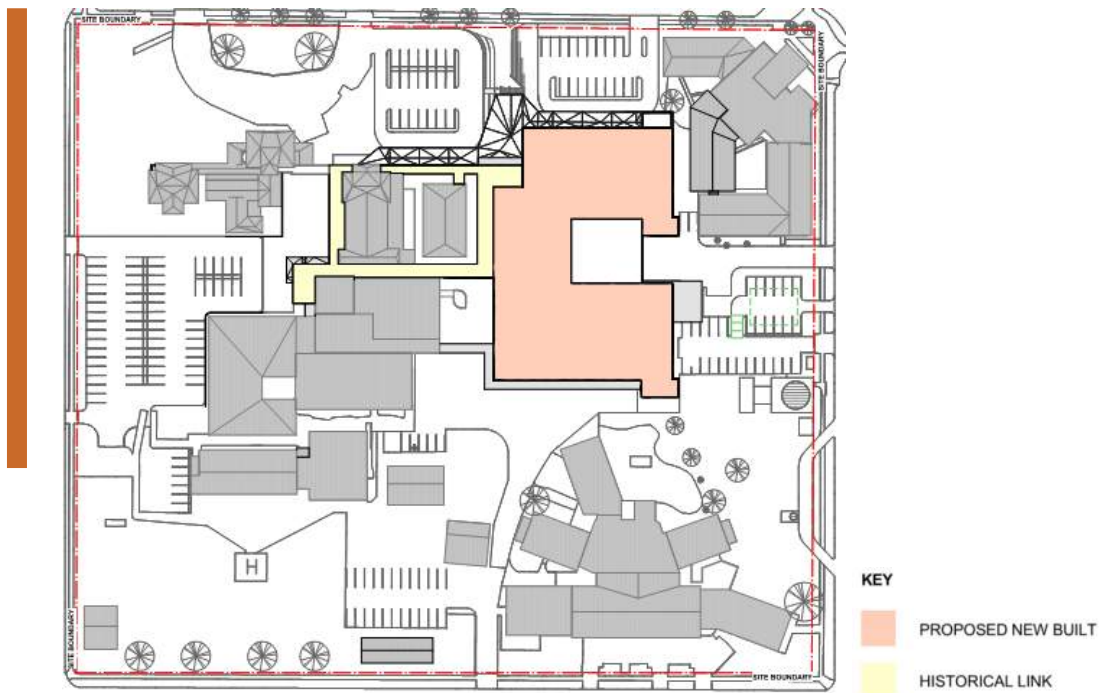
Extract of Drawing No. AA02-0202 (Source: BLP)
